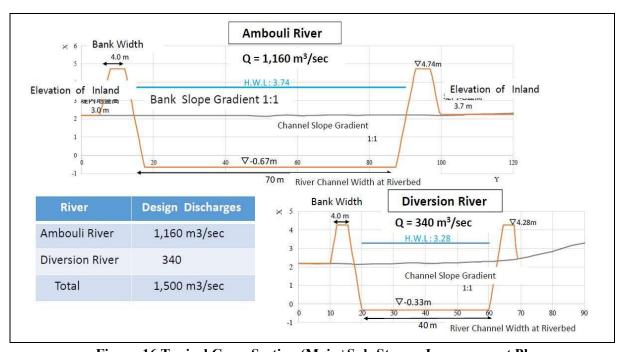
Typical Cross Section (Main+Sub-Stream Improvement Plan, Q=1500m3/s [Q1=1160m3/s, Q2=340m3/s])
